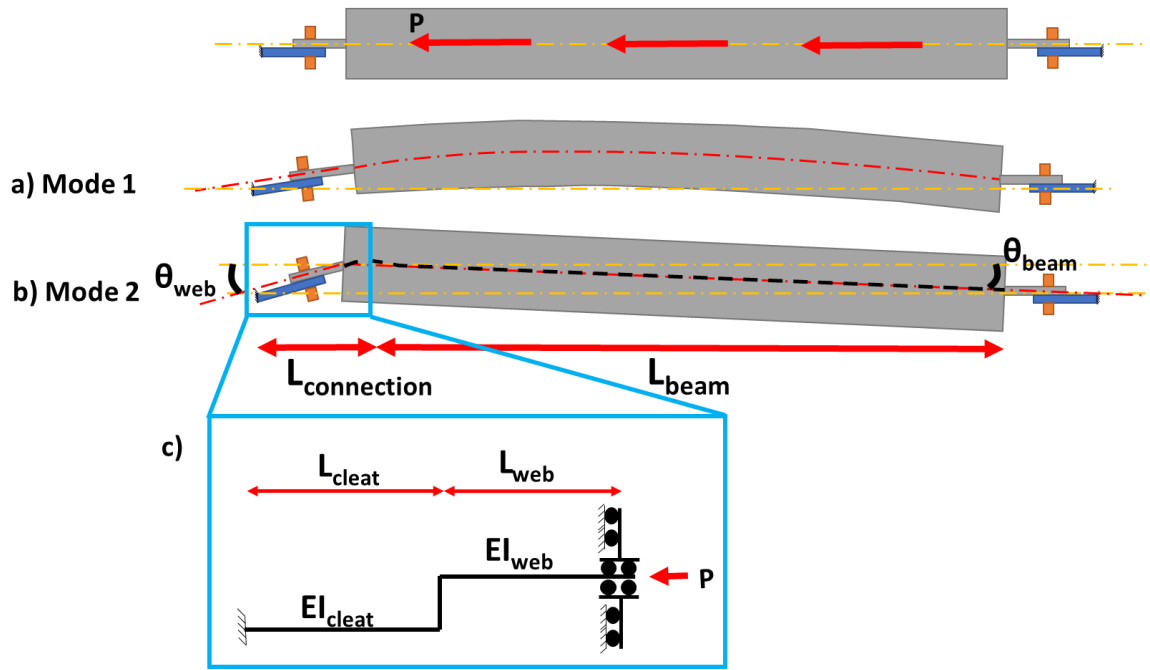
Schematic deformed shape of beam and connection under axial compression force
